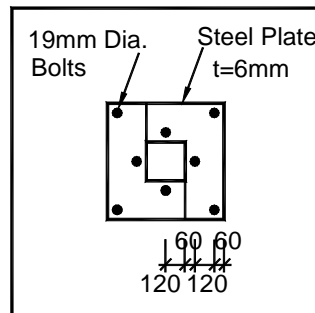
Slab strengthened by steel bolts and plates (Ebead and Marzouk, 2002)
